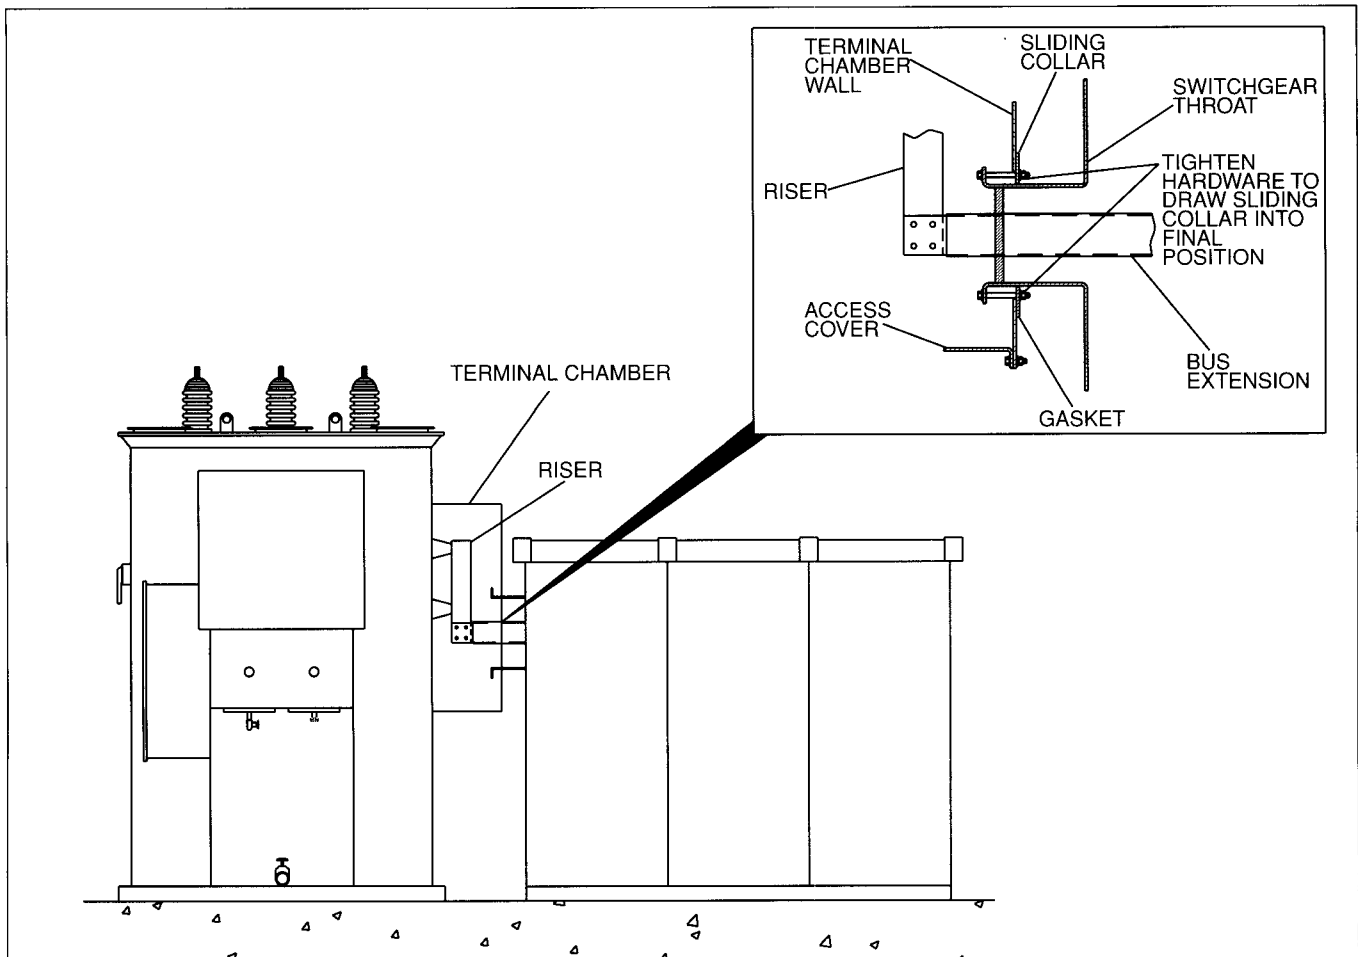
Connecting Transformer and Switchgear for Typical Outdoor Installation
